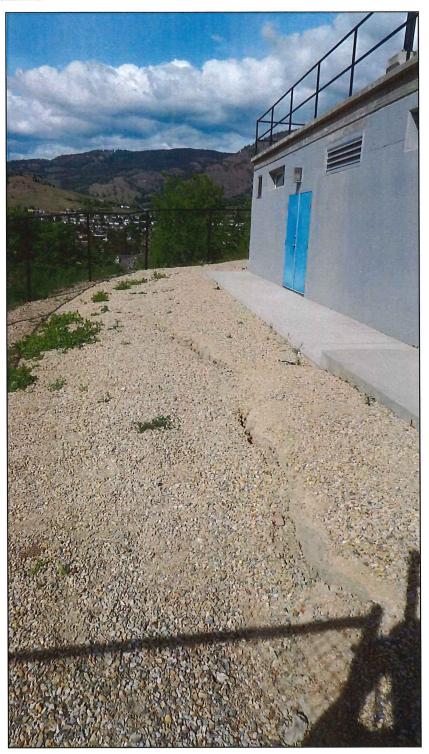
Looking at the tension crack on the northwest side of the Pump Station. Note the vertical and horizontal separation.
